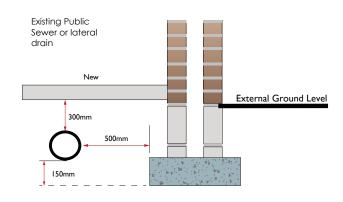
Detail (h) Distance between the floor of the new building and pipe
